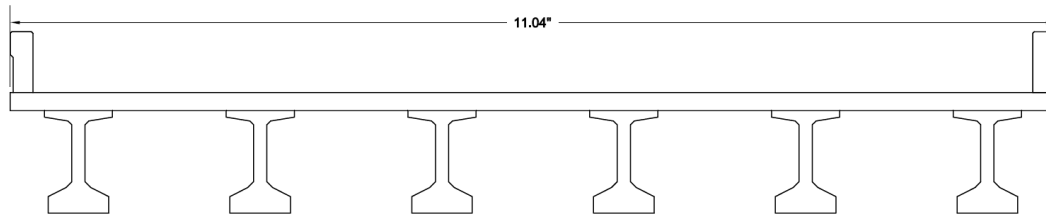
Figure 11- Bridge Model 2: 46’ wide deck with six TX-54 girders
